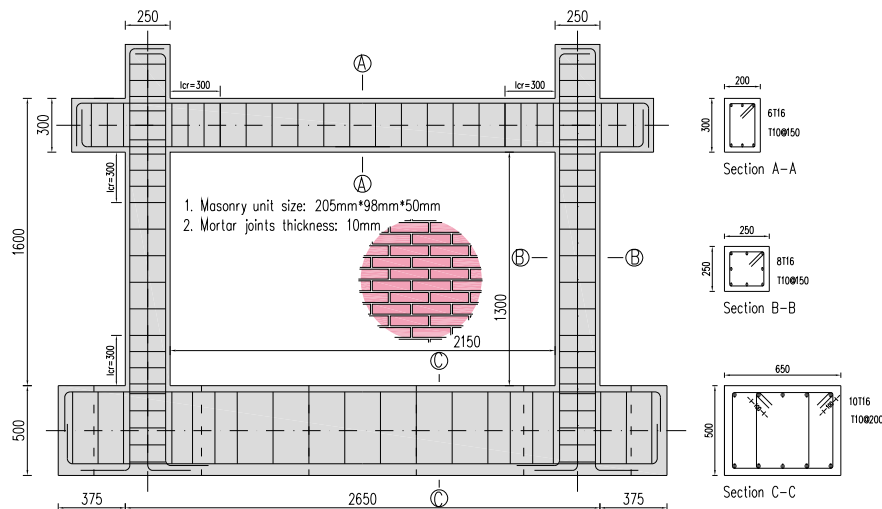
Geometry and Reinforcement Layout of Test Specimens (unit: mm)
